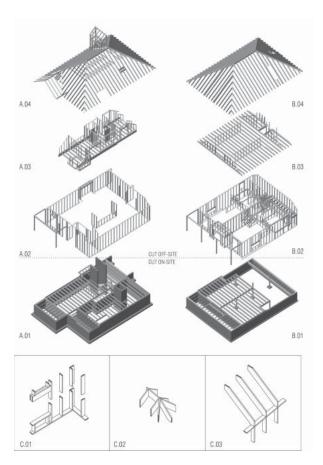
Exploded axonometric of CNC milled stick frame (A.01 – B.04, Top), optimized framing corner detail (C.01), CNC milled roof framing at hip (C.02), alignments of rafters and studs in optimized framing (C.03), Bottom. (illustrations by curb)
